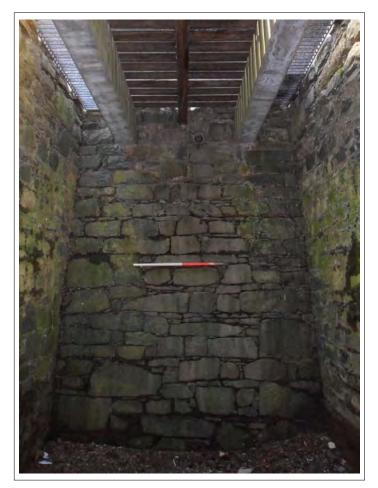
View of west wall of drawbridge pit Looking west, Scale 1x1m
